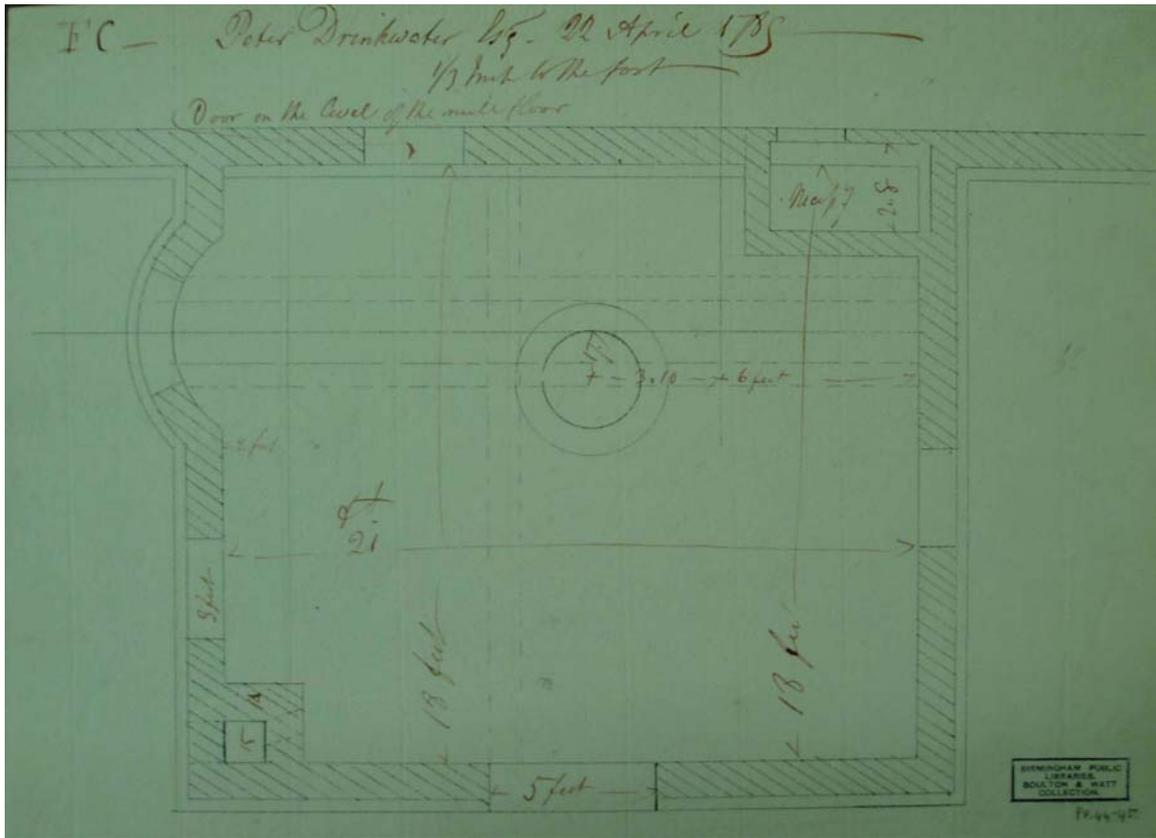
Sketch plan of proposed engine house by Boulton and Watt, 1789
